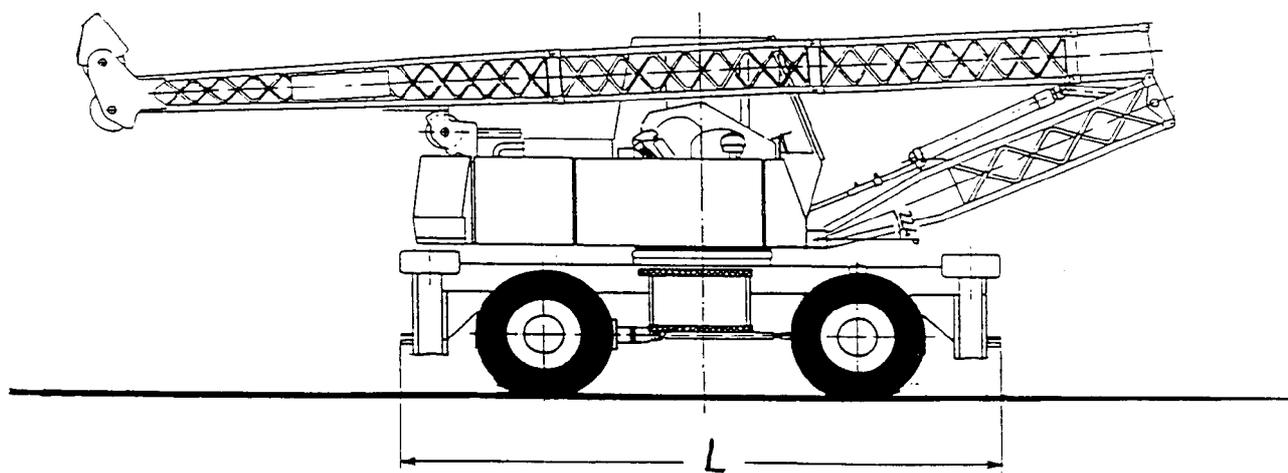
Wheel type cable excavator in transport position for road travelling
